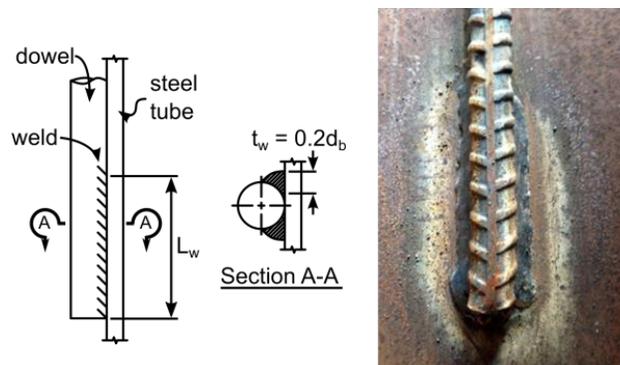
Flare Bevel Groove Weld Between Longitudinal Dowel and Steel Tube
